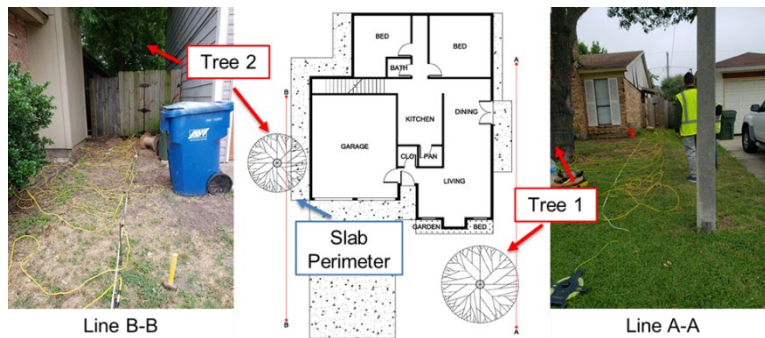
ERT Resistivity Layout and Site Plan. Note: VegaMartinez, R. (n.d.). [Photo and sketch of house floor plan and tree location].
